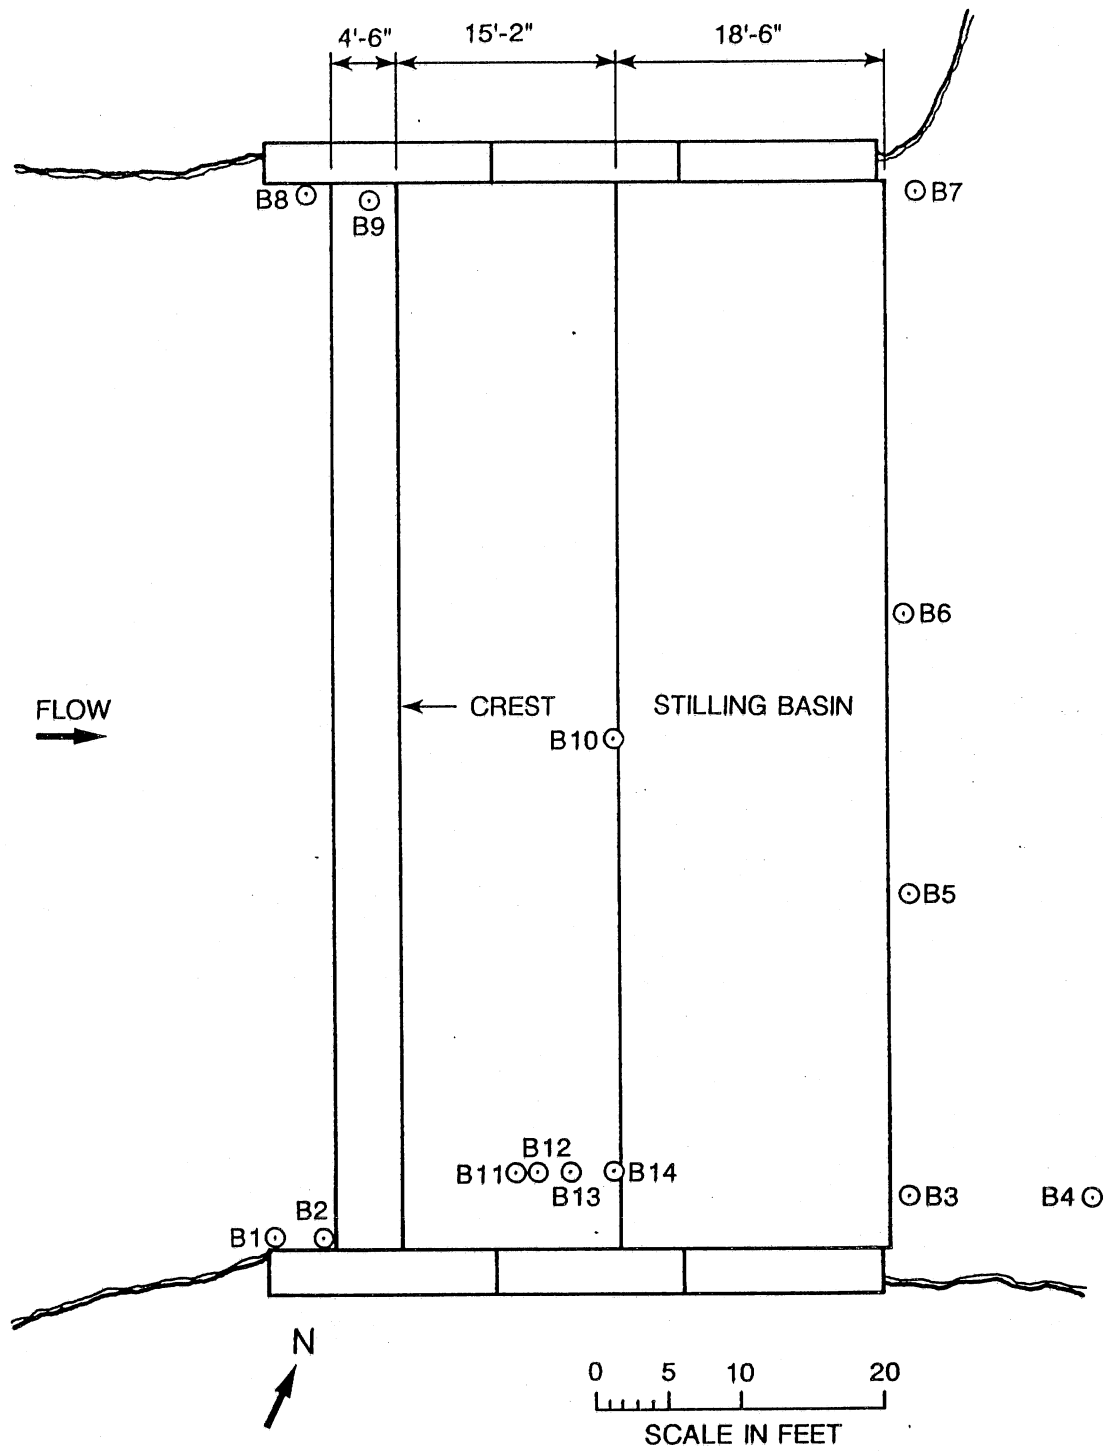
Plan view of March 12, 1985, sampling locations.
